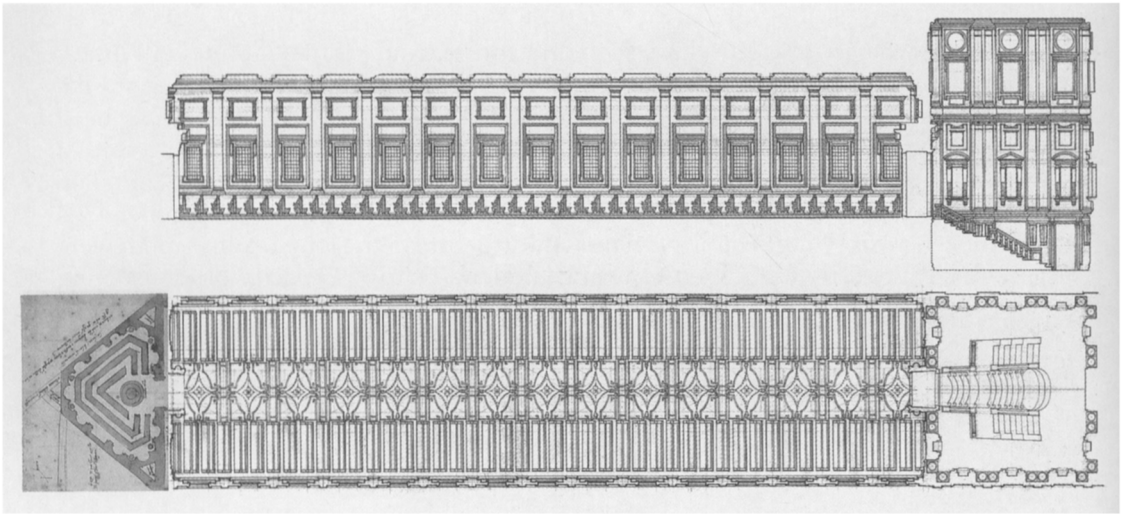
Section and plan of the Laurentian Library as built (drawing: author), with Michelangelo, Casa Buonarroti 80A, sketch plan of rare books room (Casa Buonarroti)
